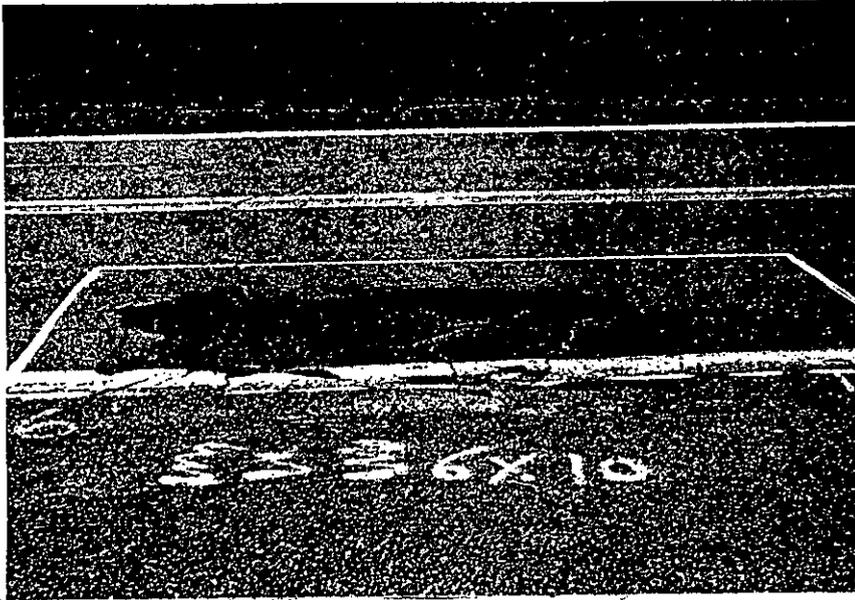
Illustrating Alligator Cracking in Outer Wheel Path at Transverse Shrinkage Crack
